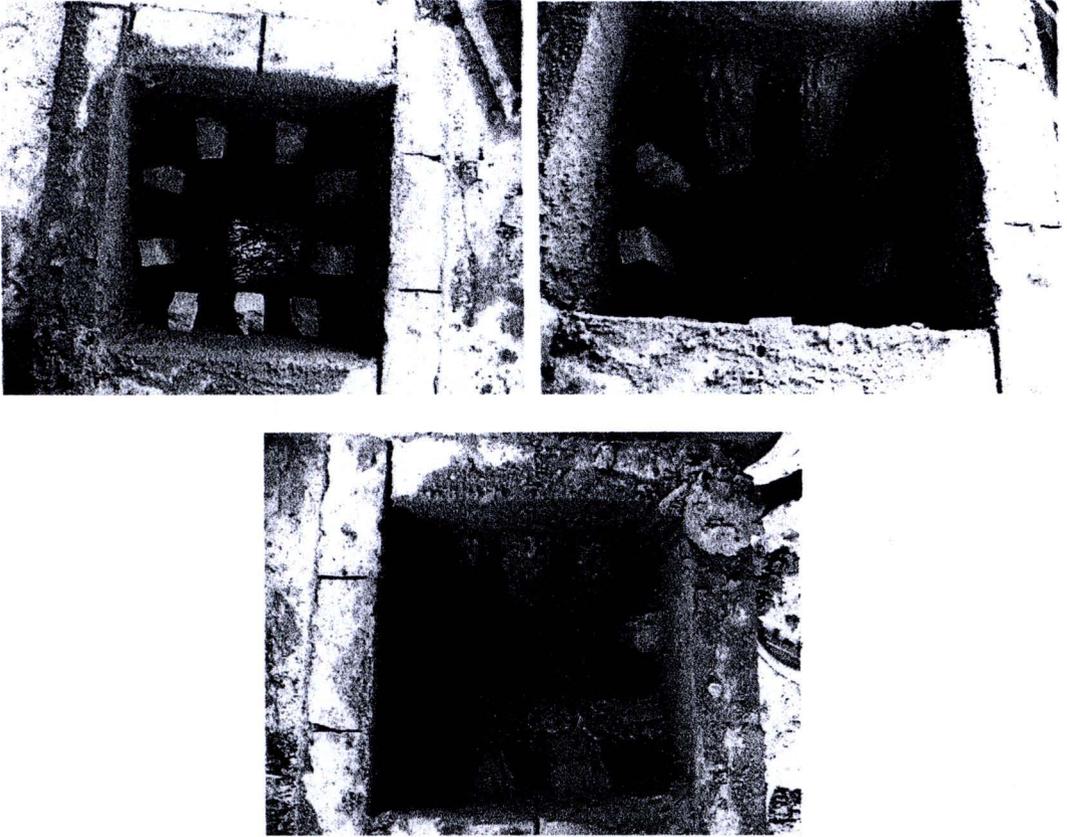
Another brick arrangement of air circulation and plaster with clay paste.
